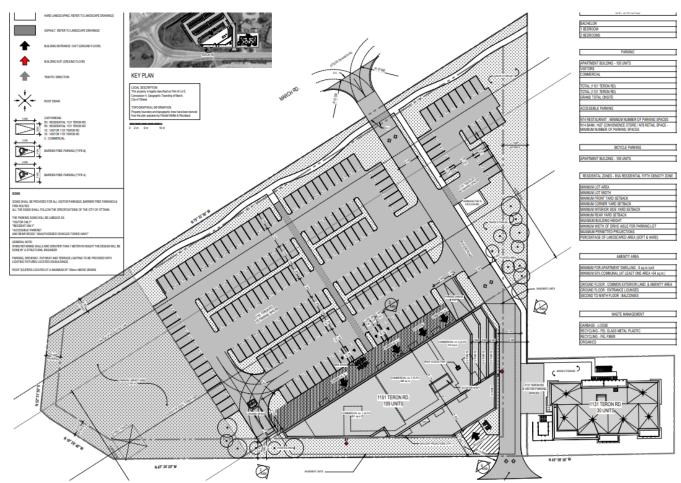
Excerpt from the Site Plan of the full buildout of the proposed development
